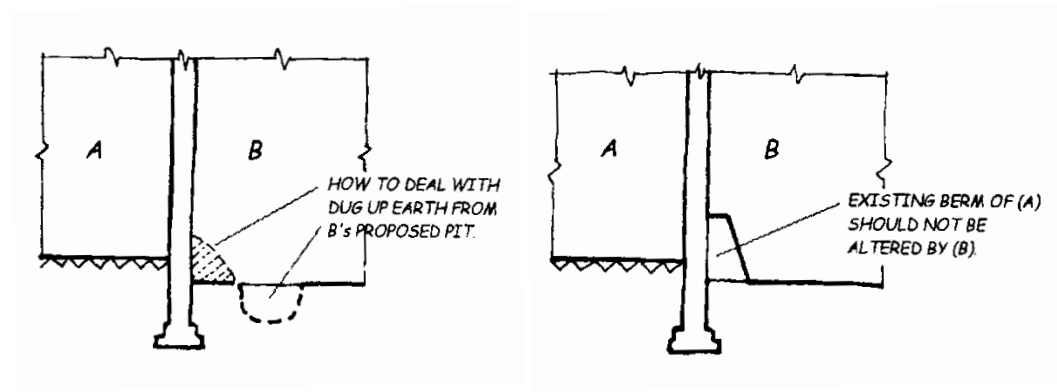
It is forbidden to pile excavated earth next to a common wall (Source: Hakim, B., 2001, p.17).
